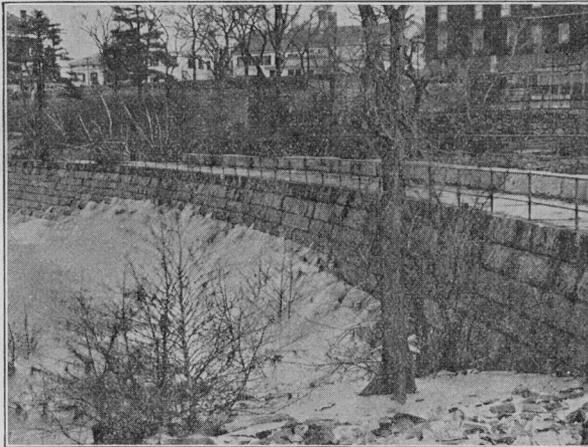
NORTHERN CANAL WALL ABOVE MOODY STREET, LOWELL
